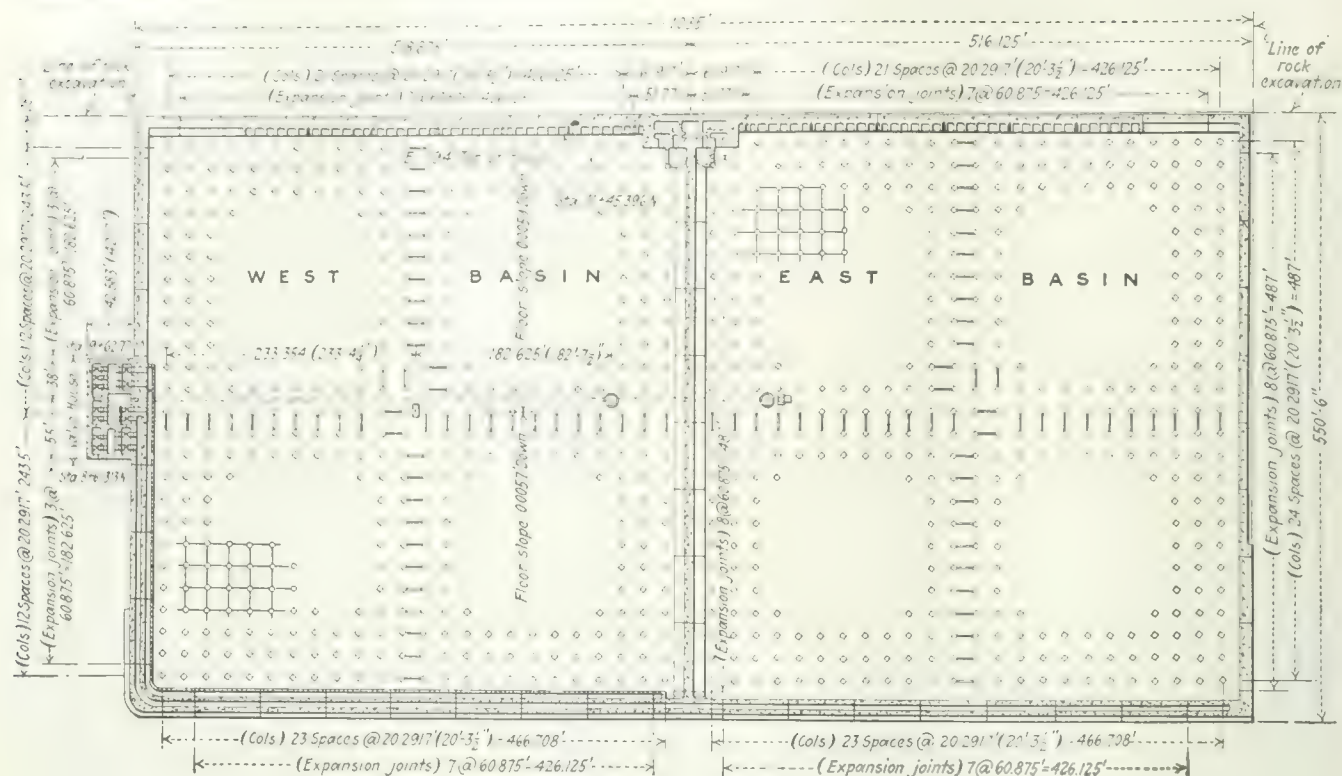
SECTIONAL PLAN OF BOTTOM OF BALDWIN RESERVOIR
